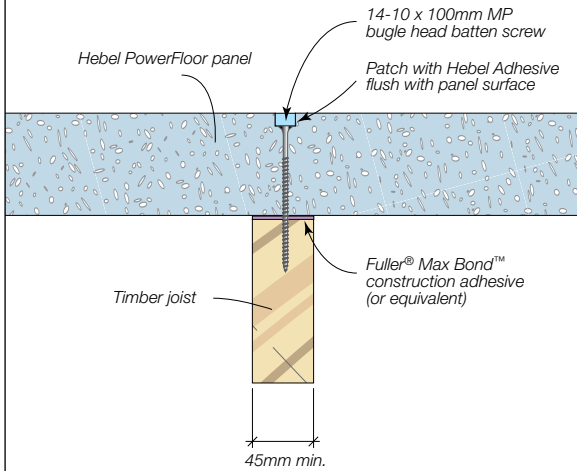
Fixing at End of Hebel PowerFloor Panel to Timber Joists
